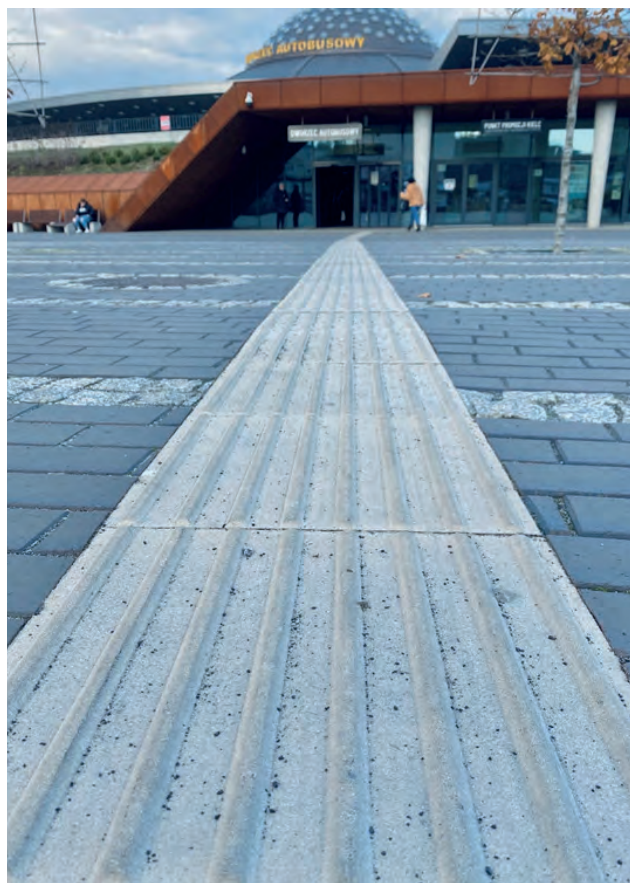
Tactile path (directional tiles) leading to a railway station entry door. Kielce. Photo: M. Wijas
